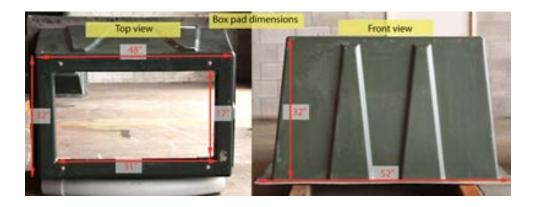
Single-Phase Sectionalizing Cabinet Box Pad Dimensions (actual dimensions may vary)
